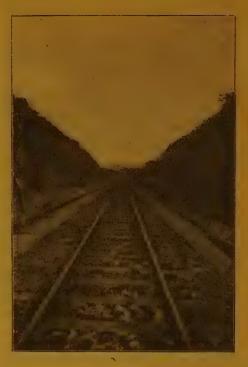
\(\simeq 323\) mile main line, 60 lb. O. S. rails, 36 inch angle plates, square joints, wet cutting, joints very low, bolts on all joints screwed up too tightly.
